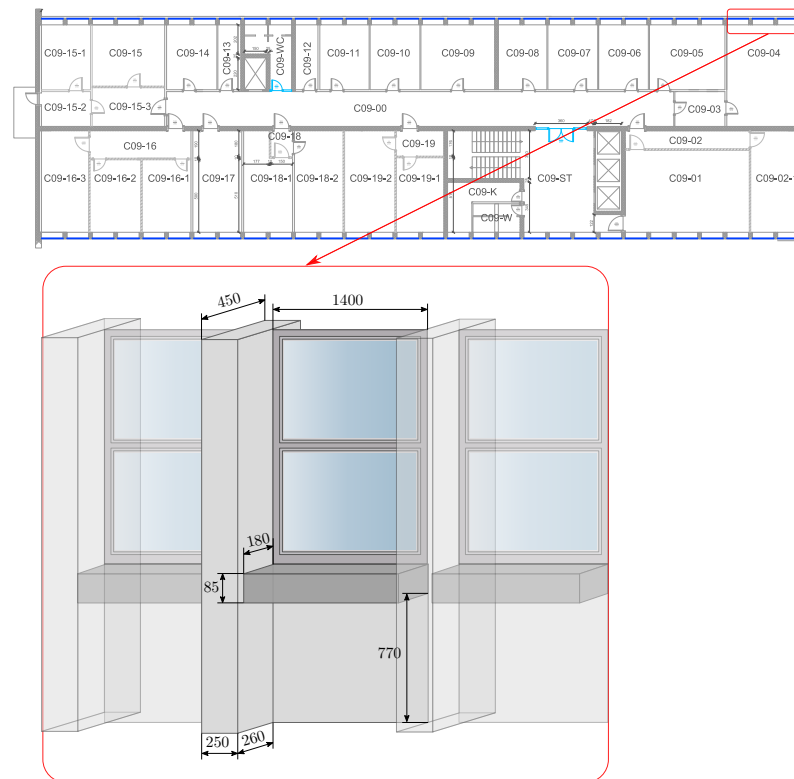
Reinforced concrete columns on south- and north-facing sides of the building.
